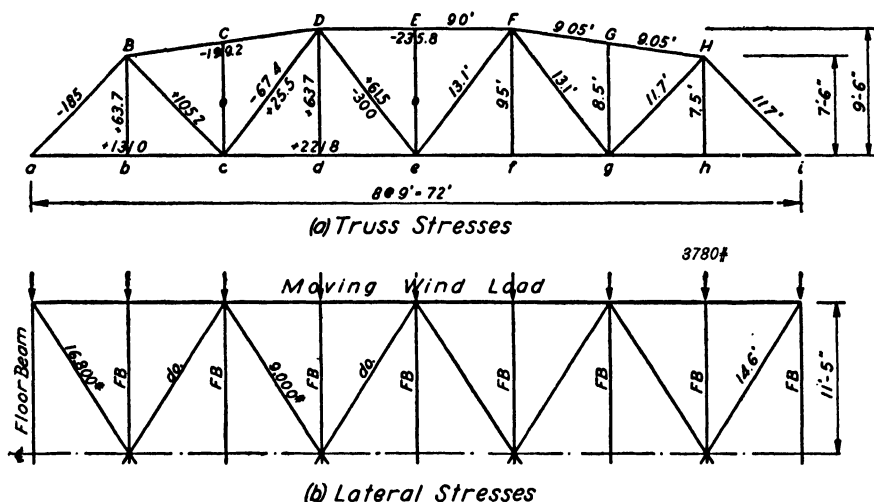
DESIGN STRESSES FOR HIGHWAY BRIDGE TRUSS.
